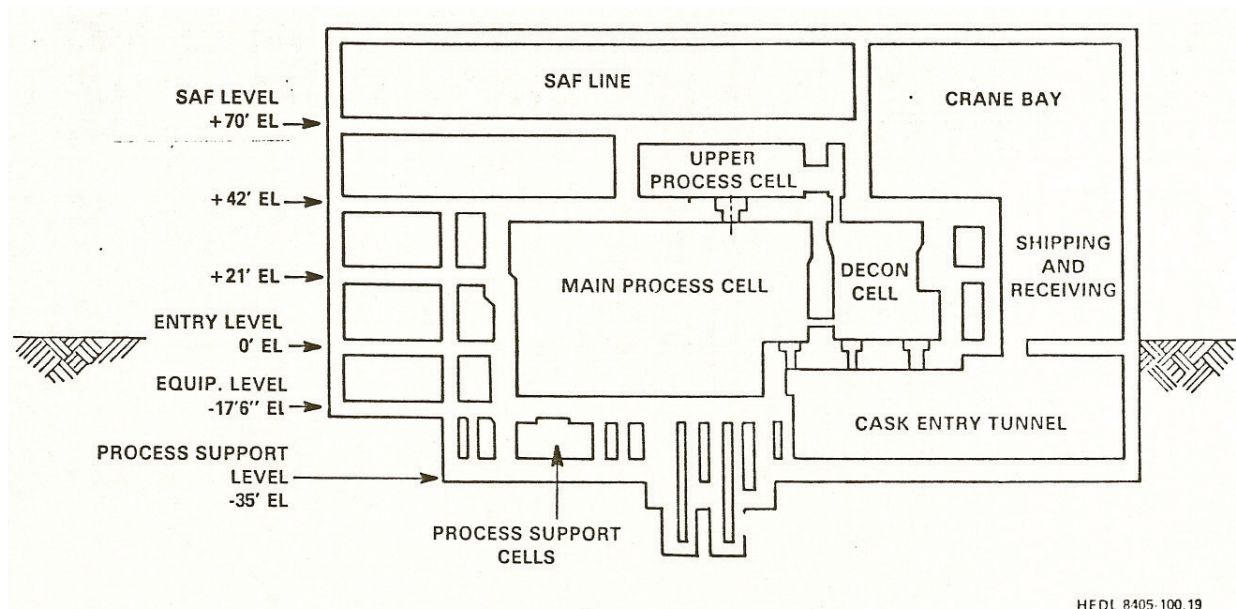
FMEF Process Building Longitudinal Section (Elevation View)
